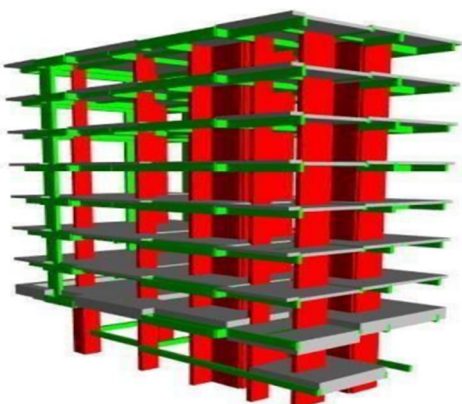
ETABS Rendered 3D View of the RCC Building Model
